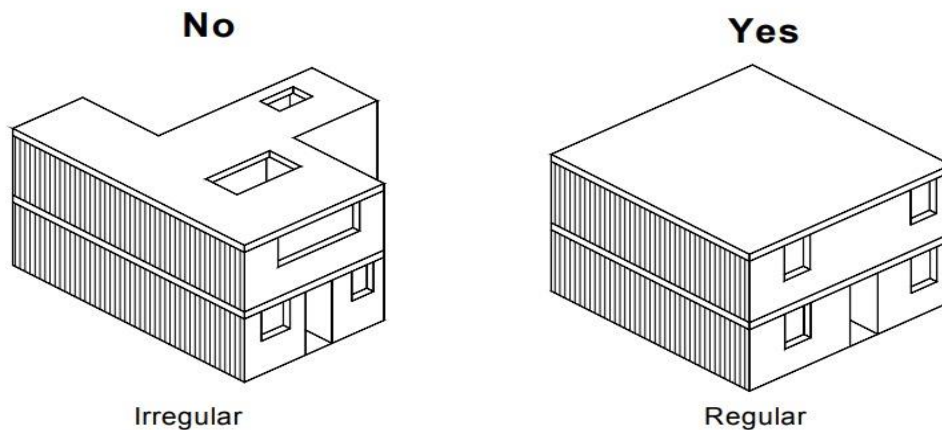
Regular building plan (*Meli et al, 2008*)
